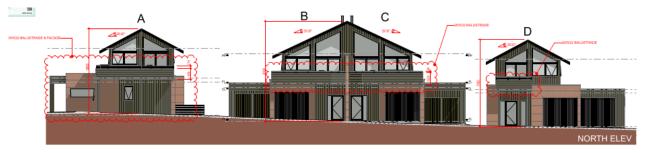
Superseded Northern Elevation - DA 10.2022.60.1
